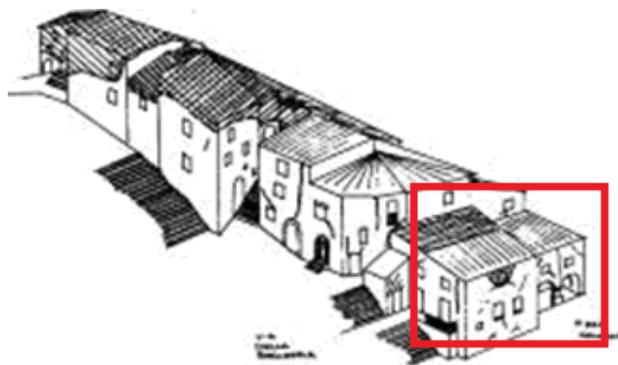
Block effect damage in rows of buildings, failure at end of row[2]
